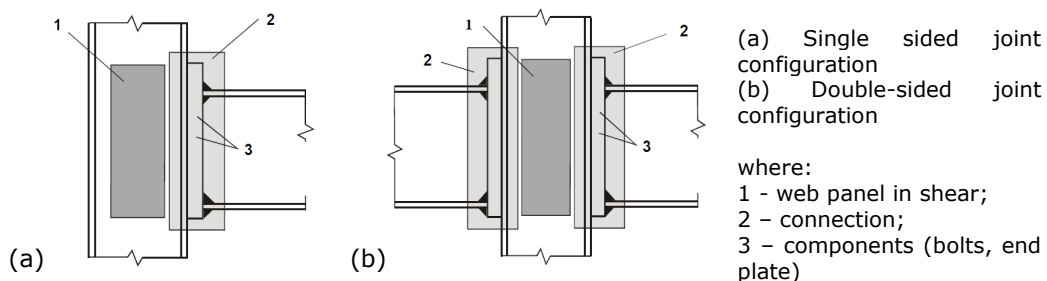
Parts of a beam-to-column joint configuration [49]
